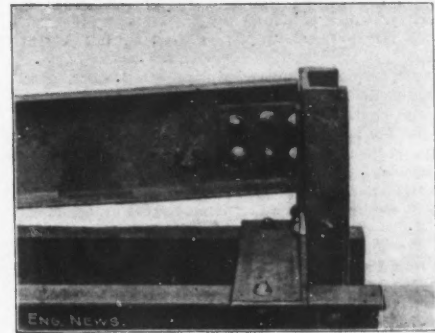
Condition of Connecting Angles on 8-in. I-Beam After Failure of Beam.
